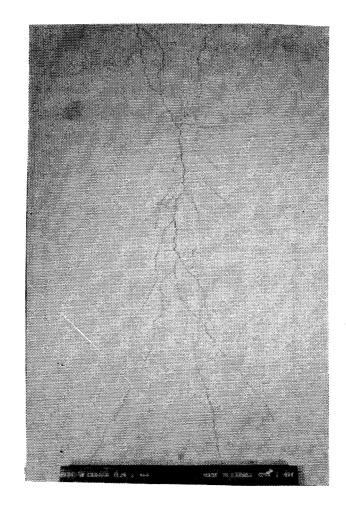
Crack Pattern in Slab of Full-Size Stub-Girder, Directly above South Exterior Stub
